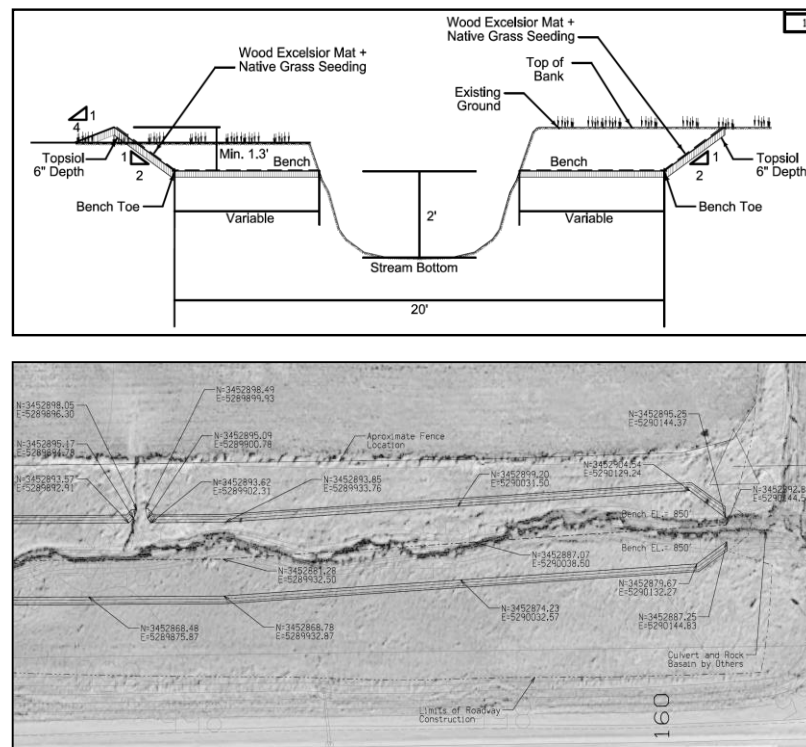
Portion of two-stage ditch construction drawings delivered by DOT. (top) cross-sectional dimensions for the two-stage ditch. (bottom) plan view of existing ditch and width of inset bench.
